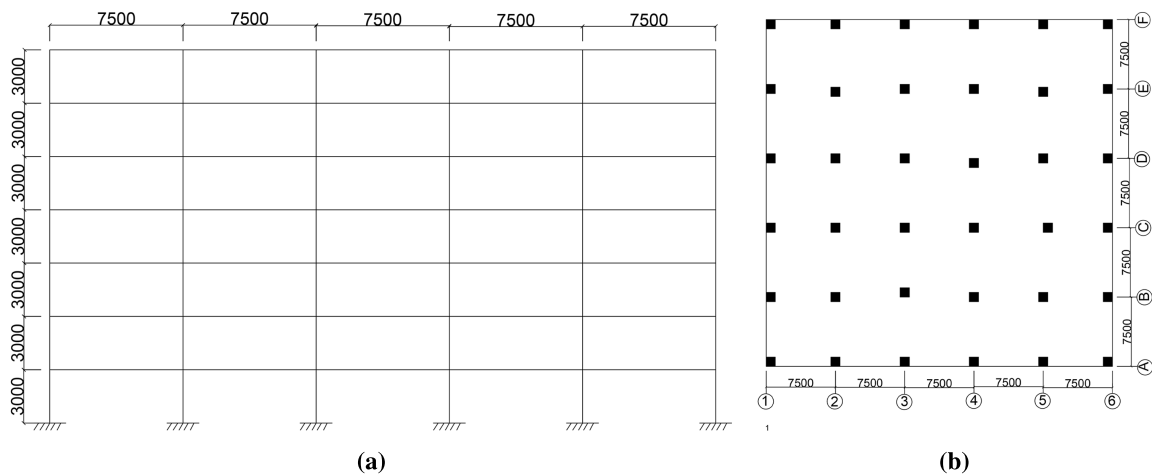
Prototype building: (a) Elevation; (b) Plan.
